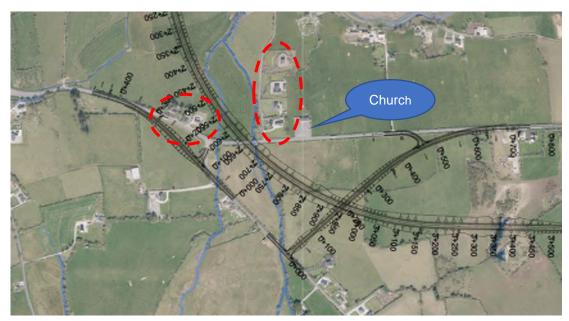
Potential Alternative Road Layout at Robertstown (Clusters of houses circled in red)
